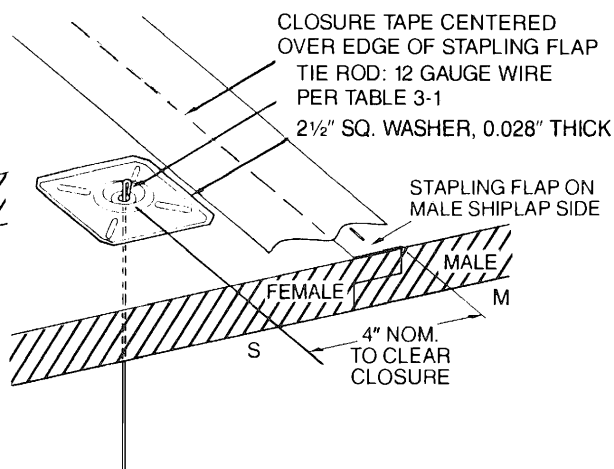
SHIPLAP JOINT REINFORCEMENT
